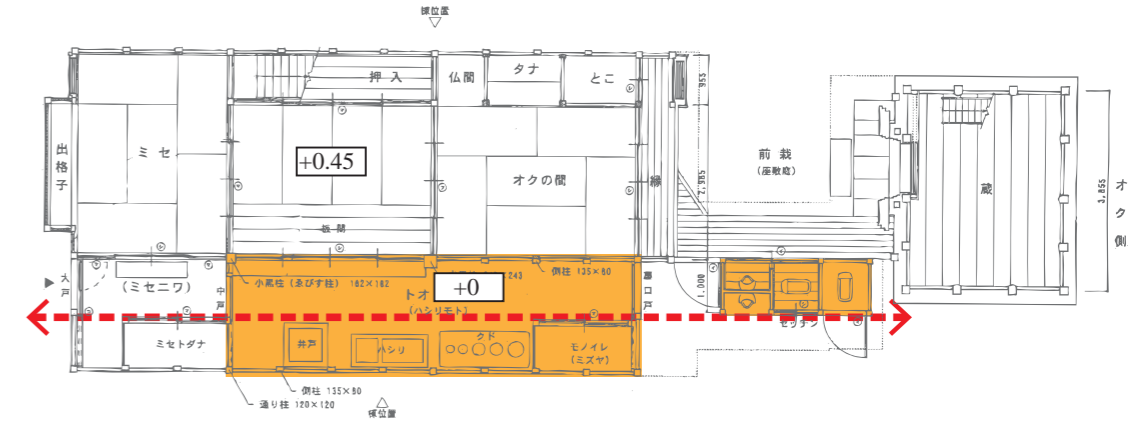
Typical Plan of Traditional Town House in Kyoto
